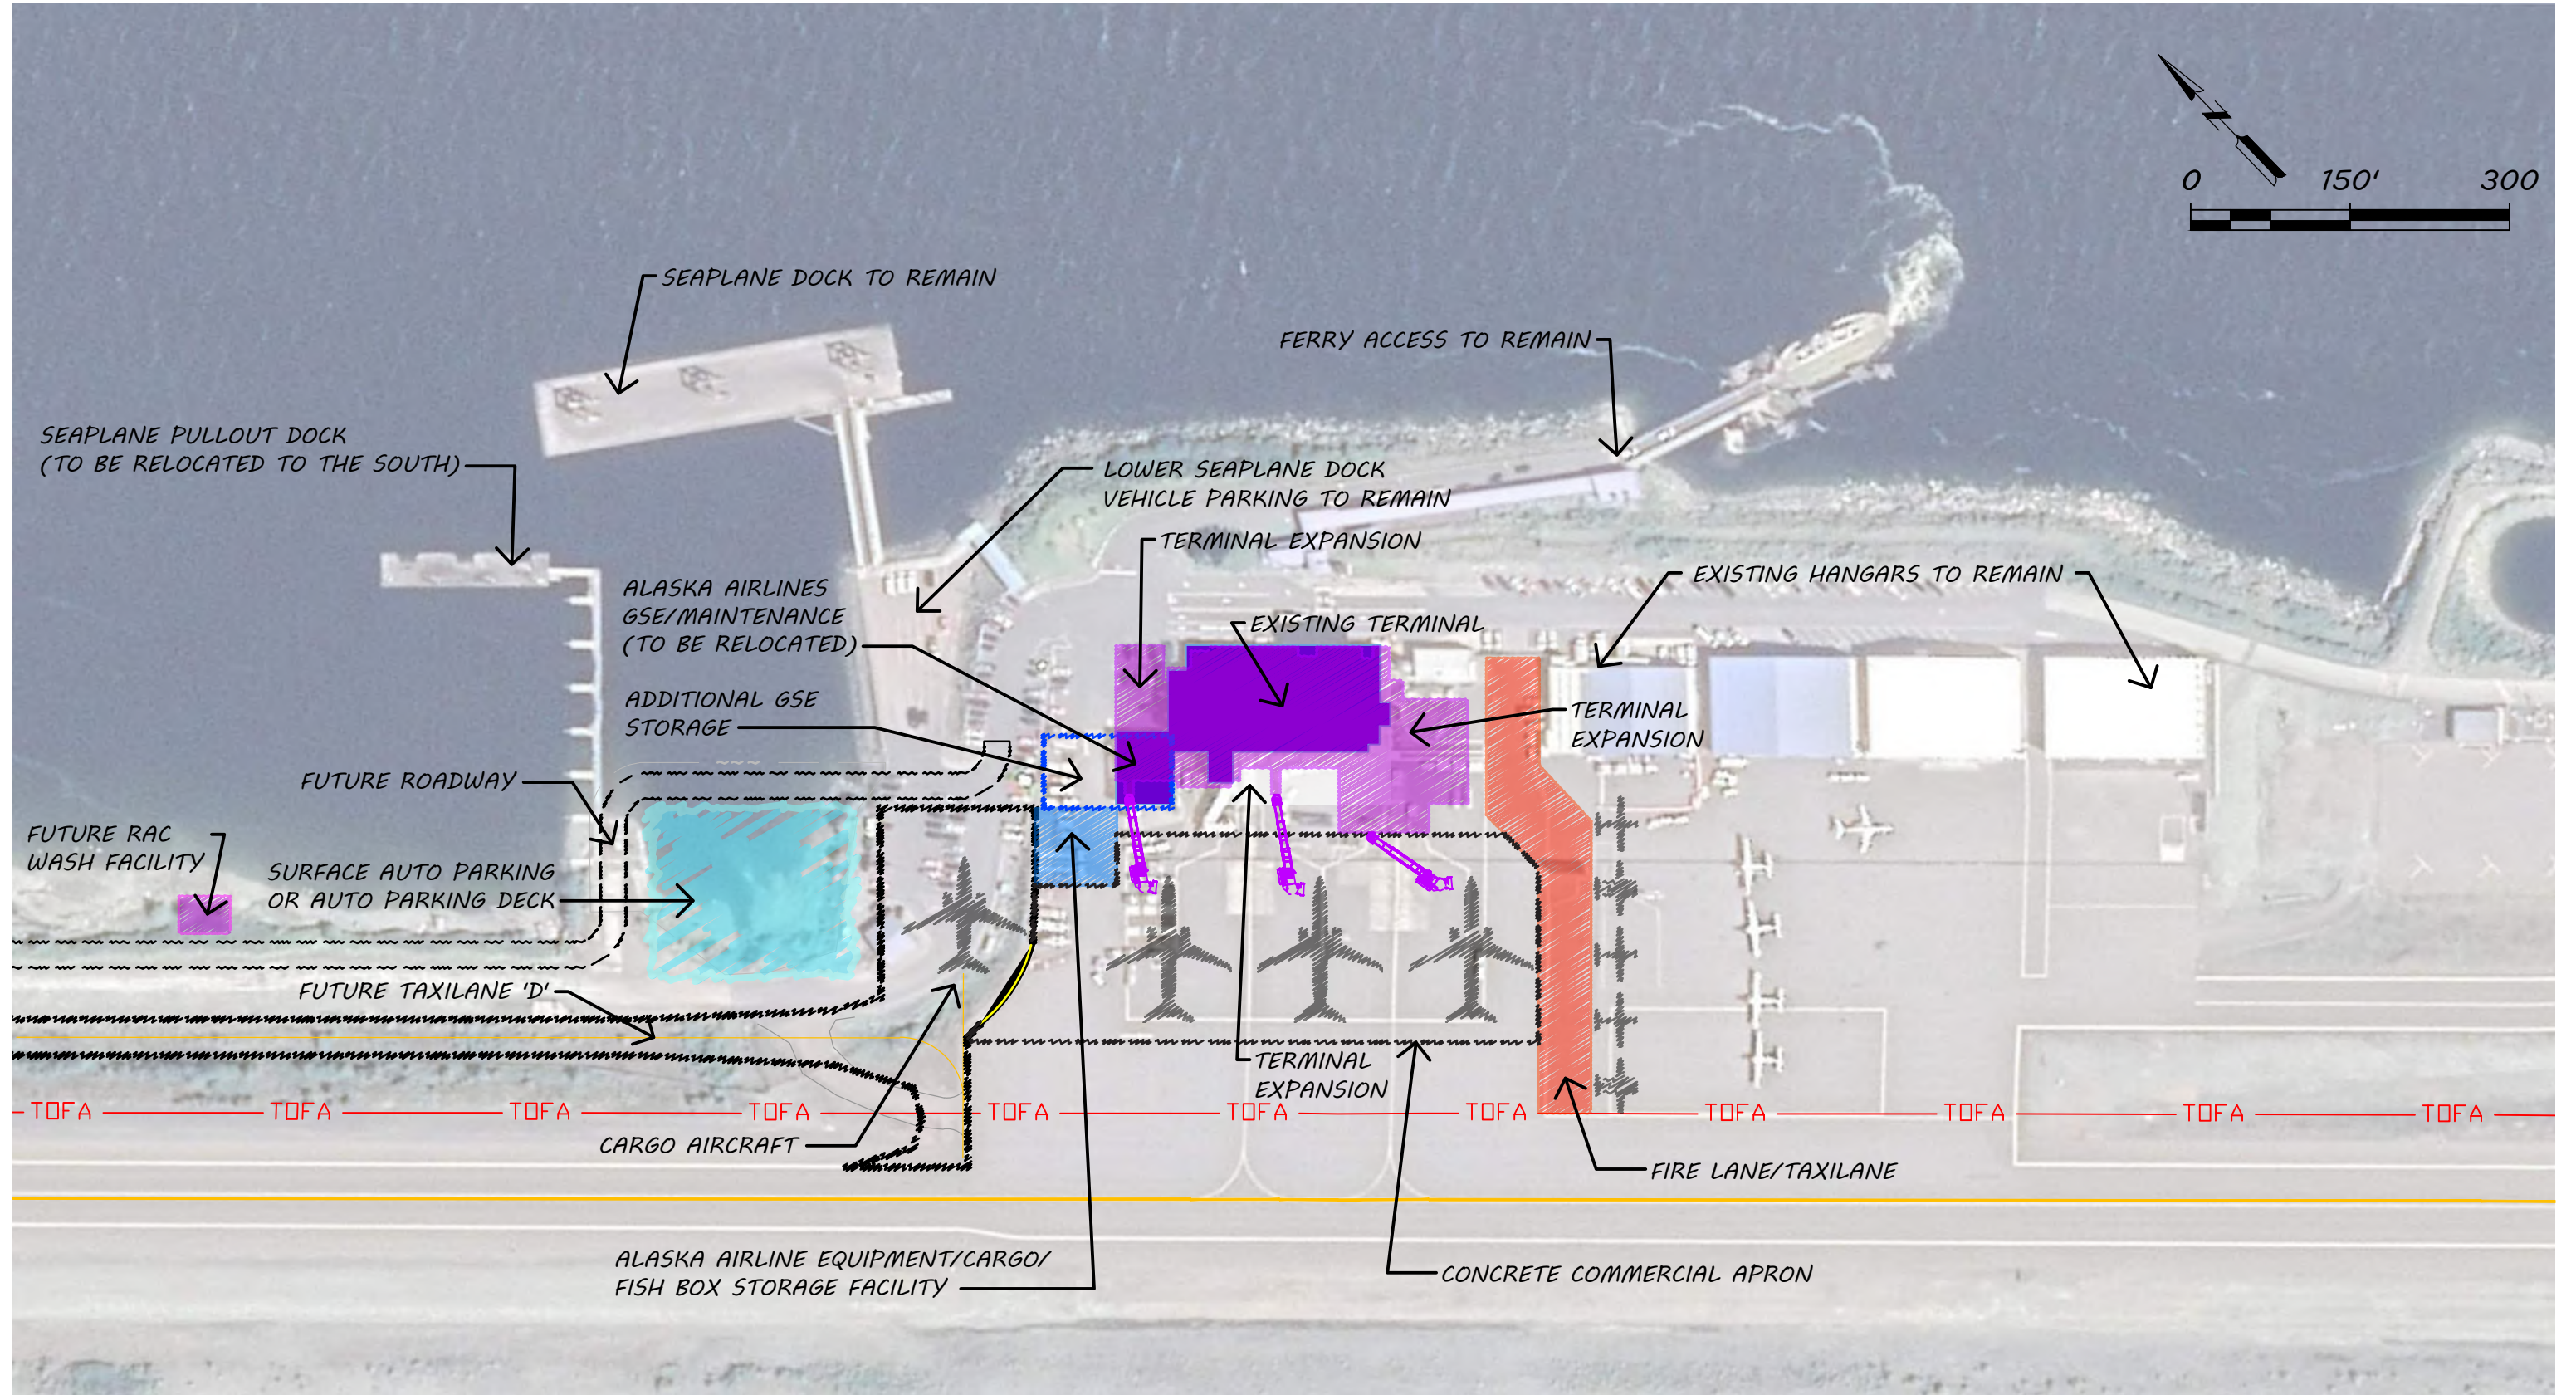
REFINED TERMINAL AREA CONCEPTUAL DEVELOPMENT PLAN
